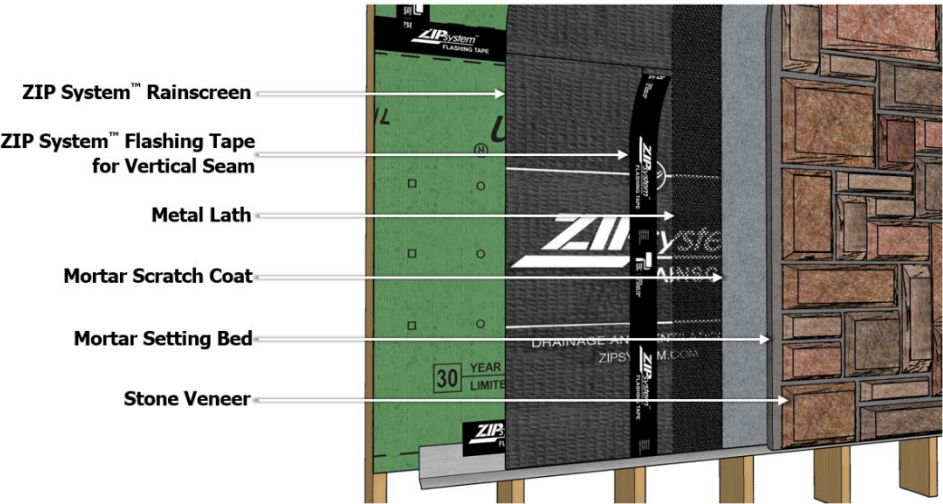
TYPICAL INSTALLATION WITH ADHERED MASONRY VENEER
